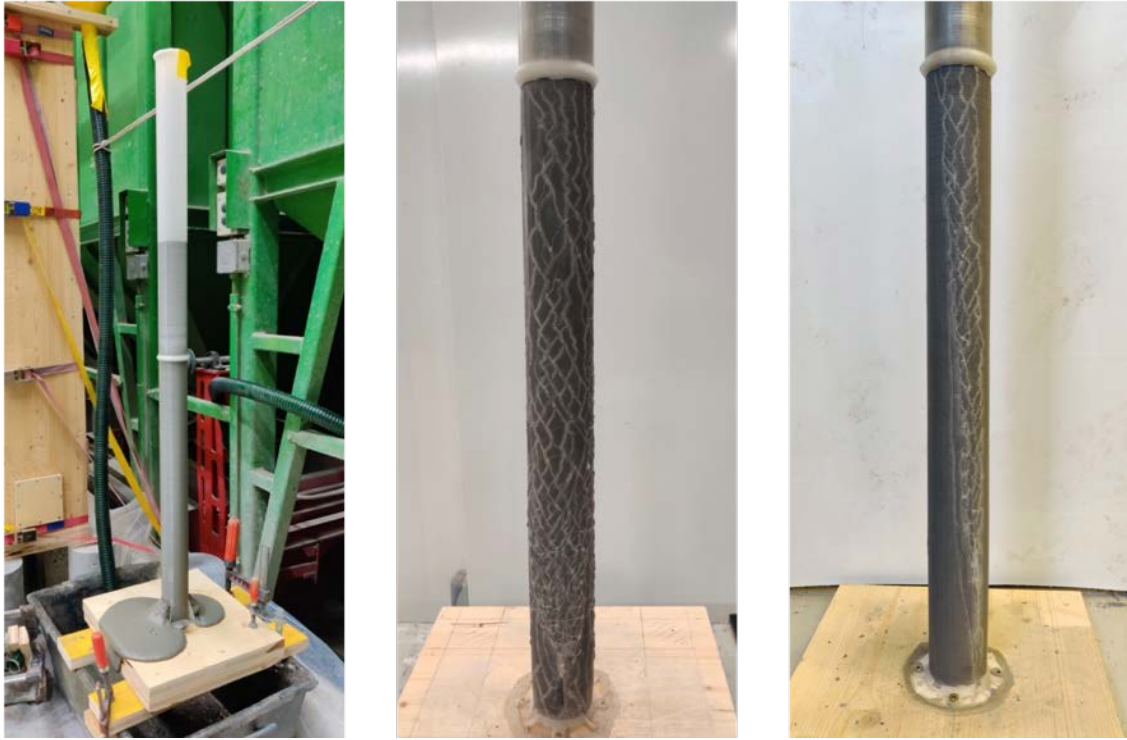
Preliminary tests on PLA tubular formwork. Left: formwork failure without CPC at a concrete height of 82 cm. Centre: formwork failure with sand CPC. Right: formwork failure with sand and lead granules CPC.
